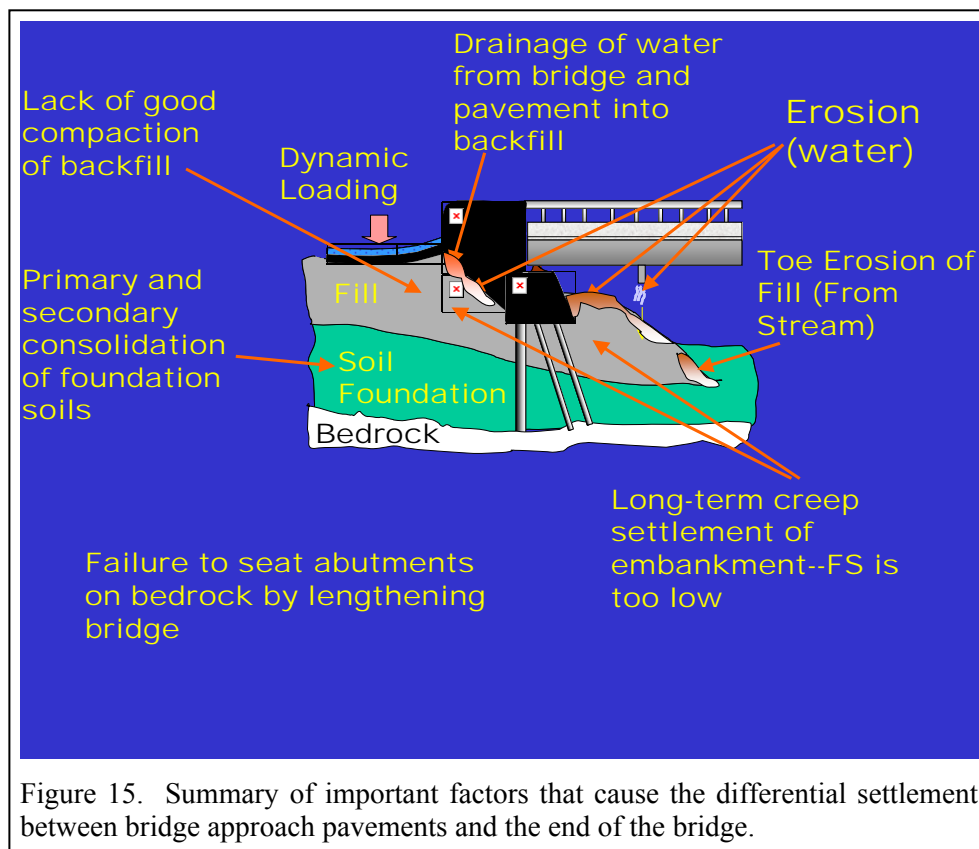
Summary of important factors that cause the differential settlement between bridge approach pavements and the end of the bridge.
